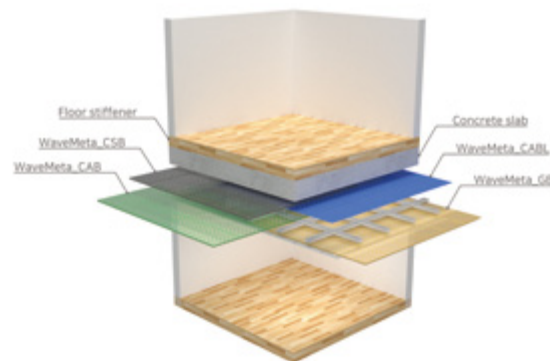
A conceptual diagram of installing Wave META for reducing noise between floors in buildings
